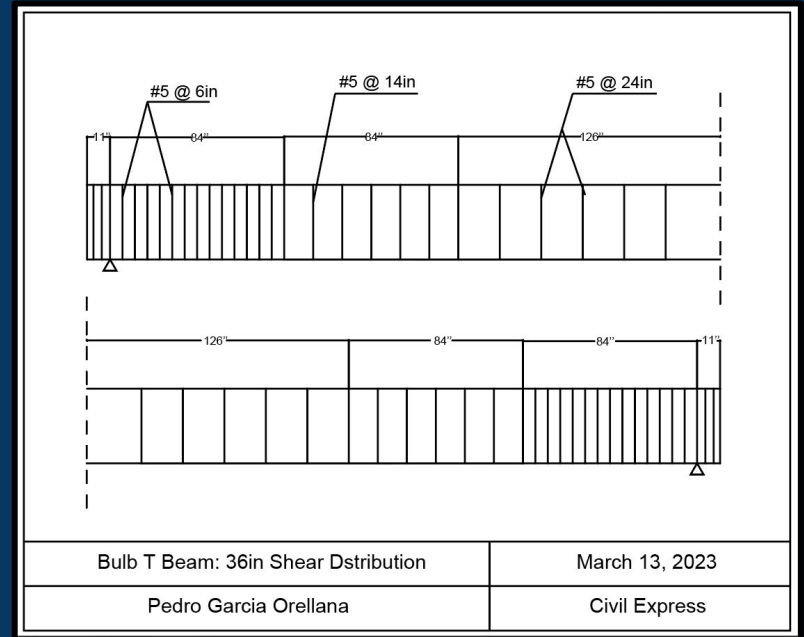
Bulb T Beam Shear Reinf. Middle Section.
